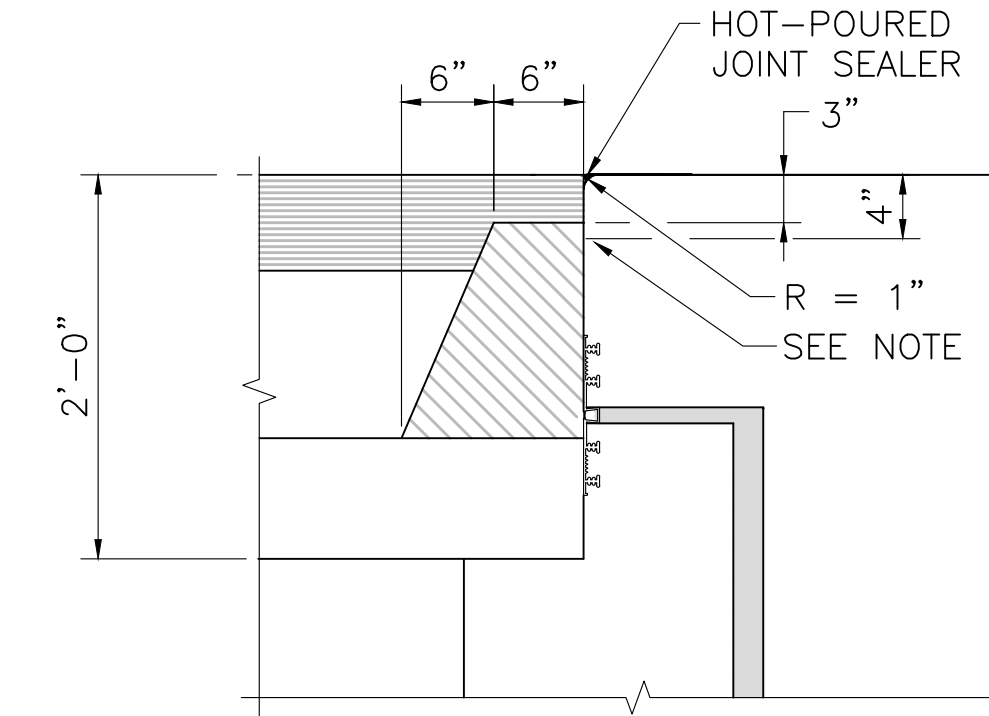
DETAILS AT ABUTMENT - ROADWAY SECTION
